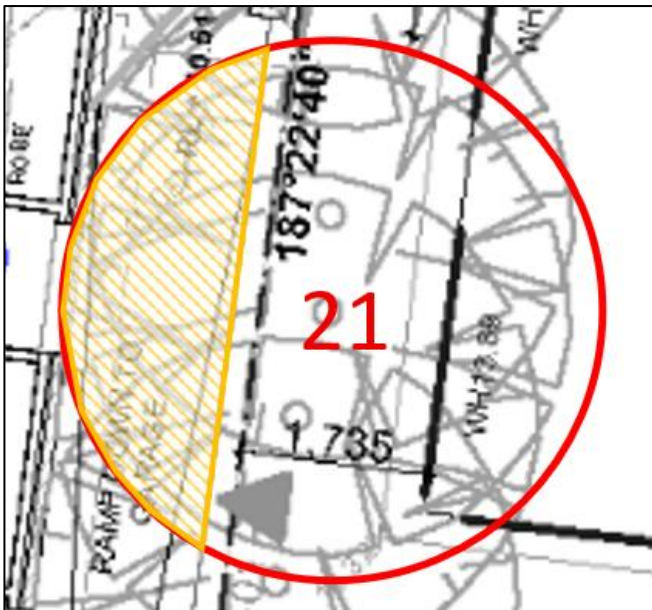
Tree 21 with major encroachments consisting of a large portion of shallow path construction.
